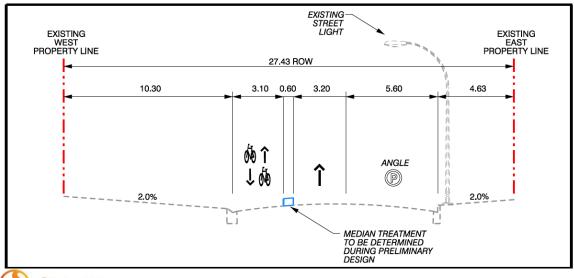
Potential 96 Street Design (South of Jasper Avenue)
